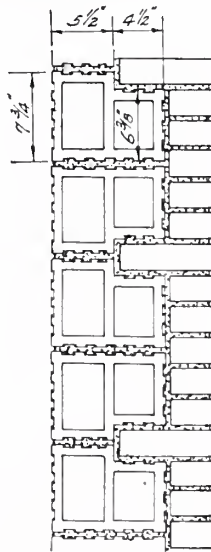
Cross section of fourteen-inch PERFECTION backed brick veneer wall.
